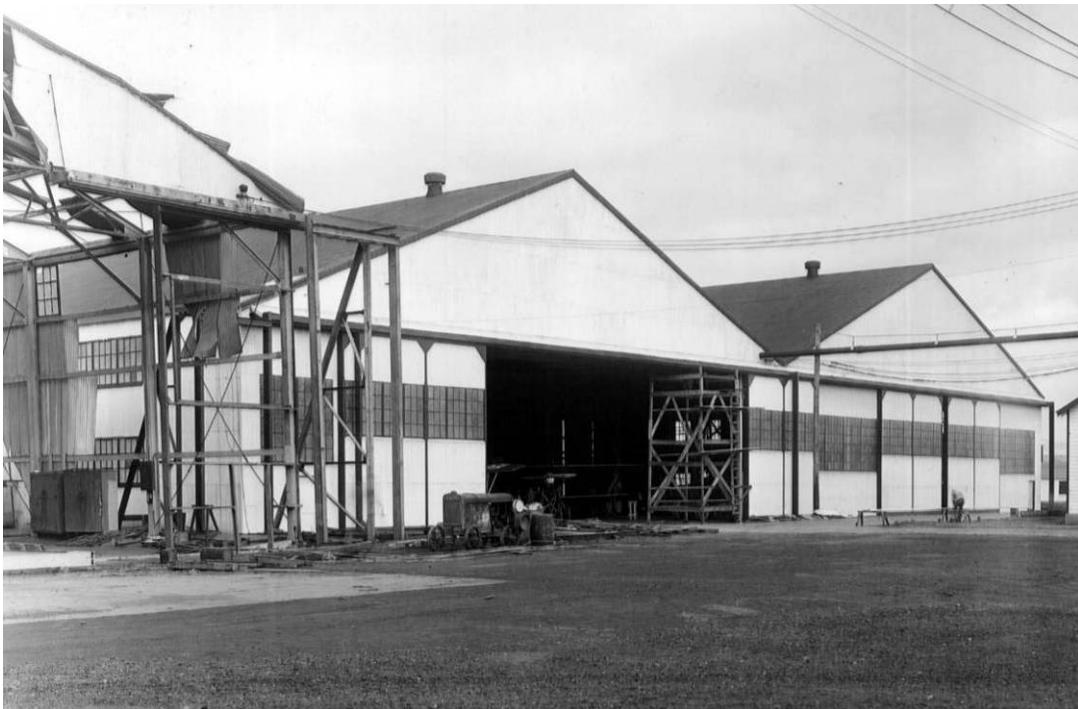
Seaplane Hangar (Building 47) November 1927 (NARA College Park RG71-CA box 14).
